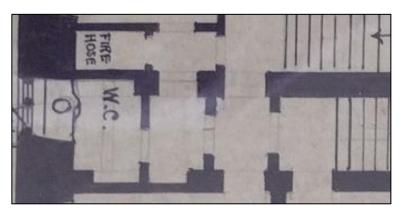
Extract from the 1909 plan of the building, first floor of Cell F
